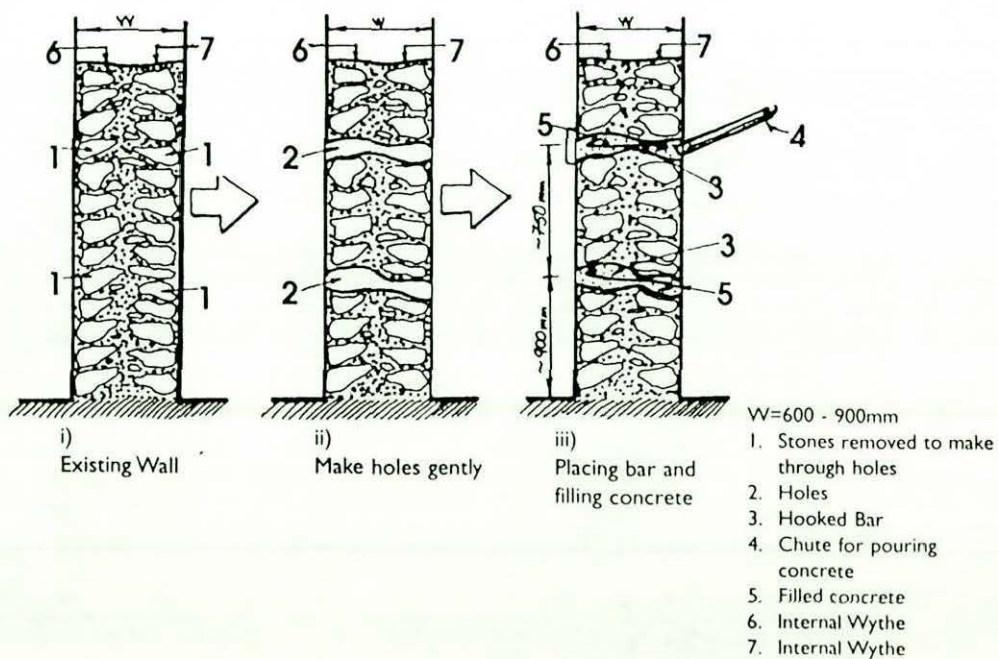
Strengthening walls of the existing buildings by stitching walls
